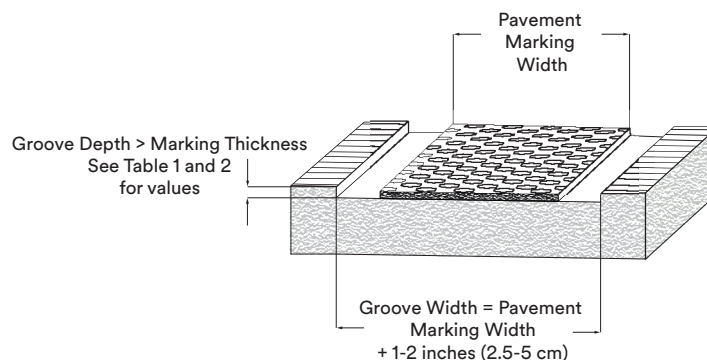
Cross-sectional illustration of a typical section of pavement marking installed in a groove.
